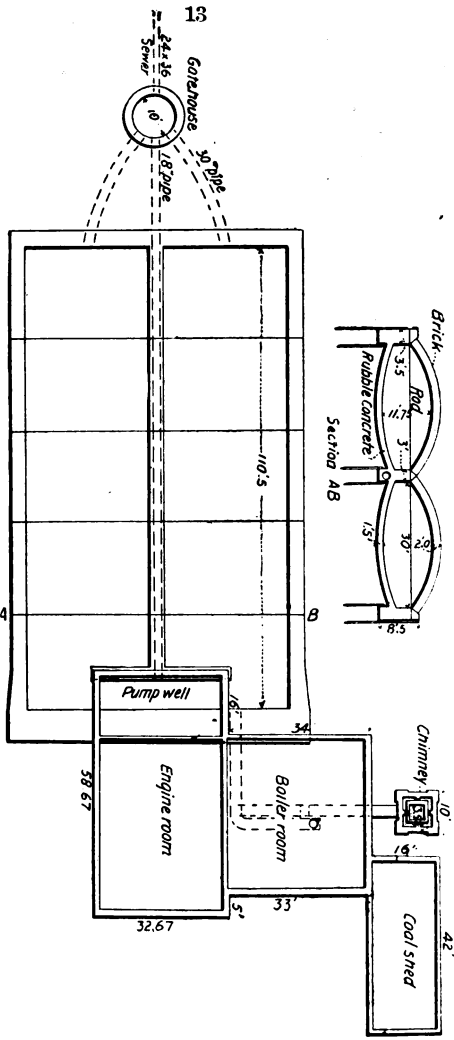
PLAN OF RESERVOIRS AND PUMPING STATION, SOUTH FRAMINGHAM SEWERAGE SYSTEM.
